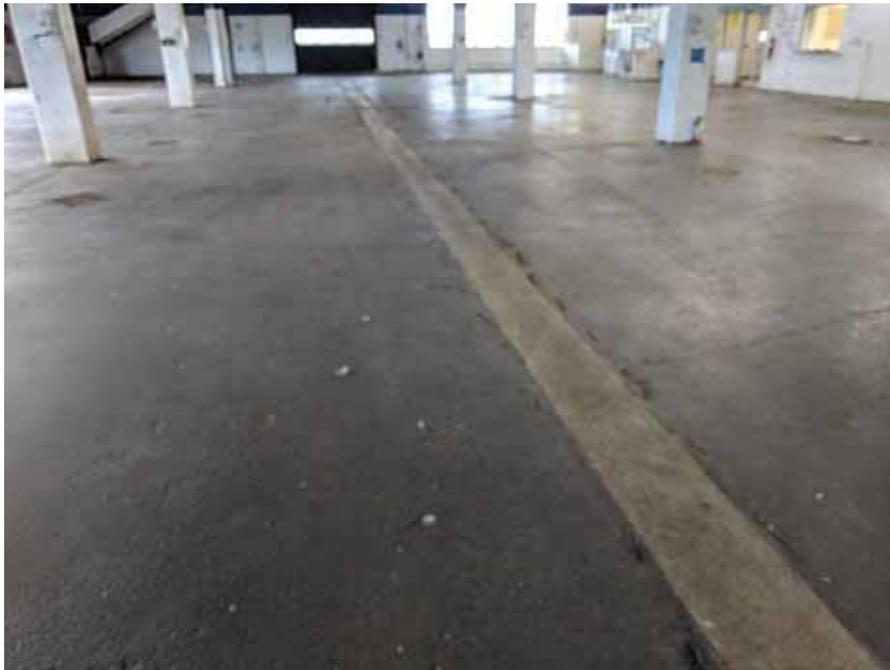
View of a former trench drain located on the first floor of the Sears Auto Center.
